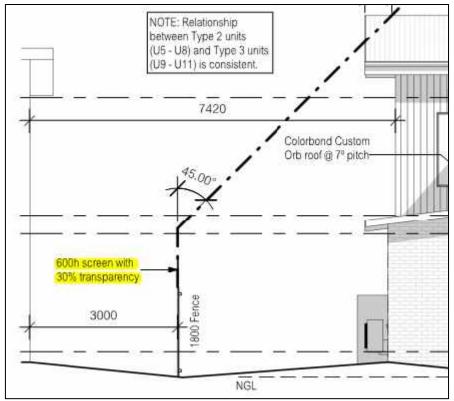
Section of site plan showing the minimum 4.5m setback of the living room window of Unit 5 to the private open space of Unit 11 (scaled measurement by author)
